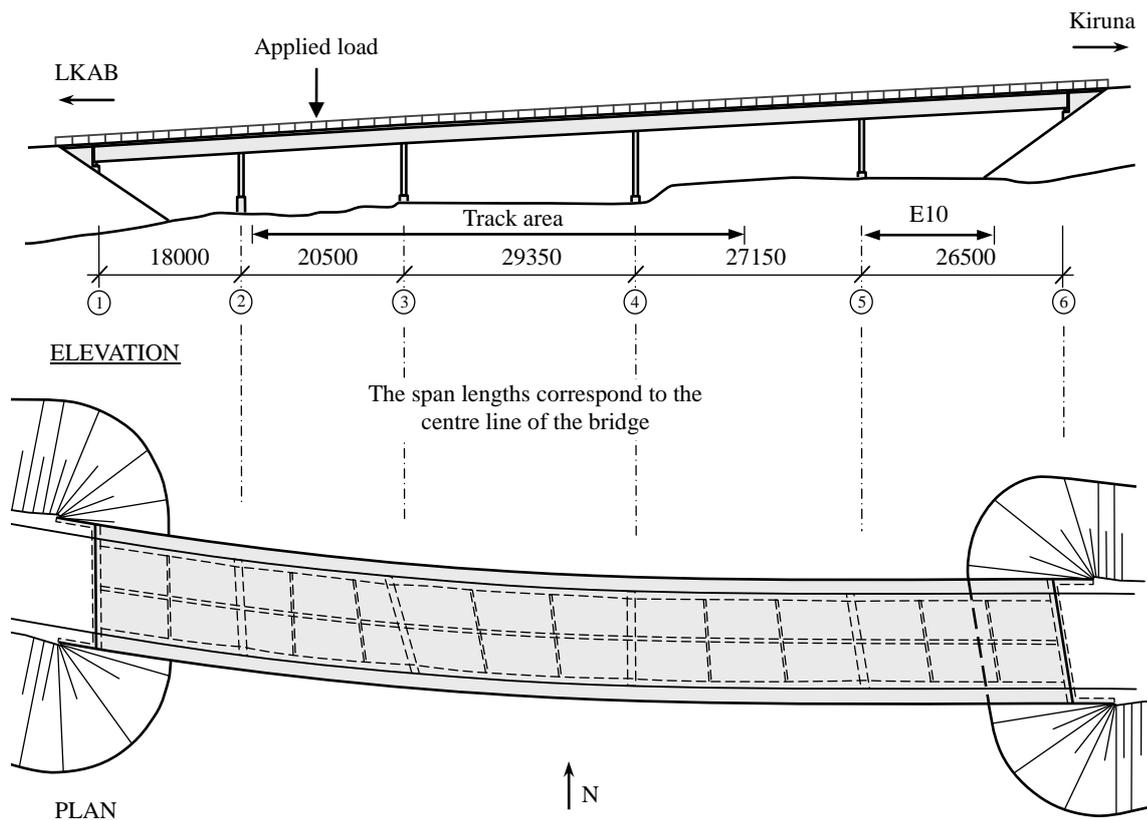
Geometry of the Kiruna Bridge and location of the load application in the test programme.
